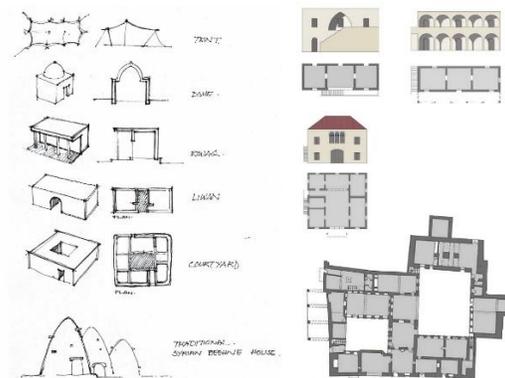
Building form, typology and layout study (top) urban spatial configuration study in plan (bottom)
